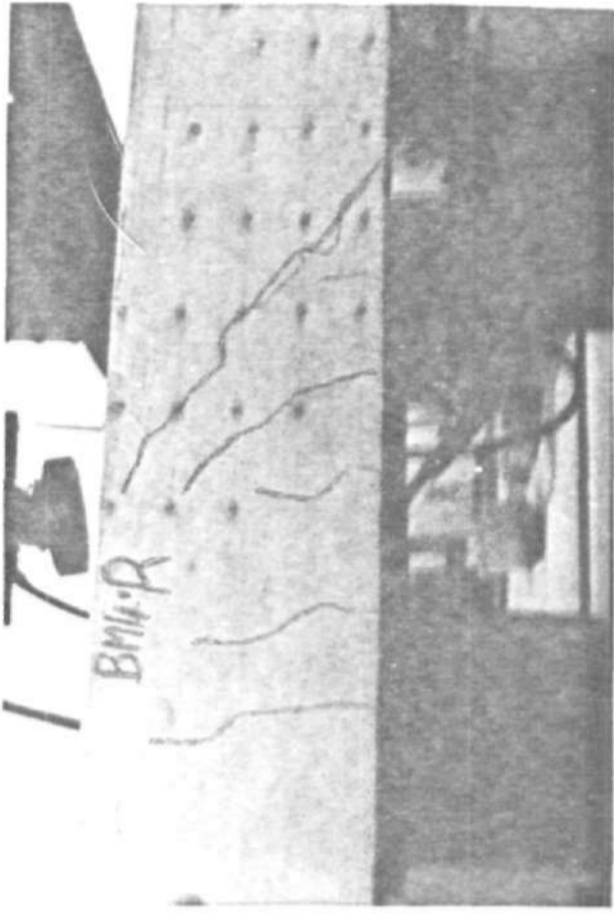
Faces of BM4 at failure showing the crack Pattern.
